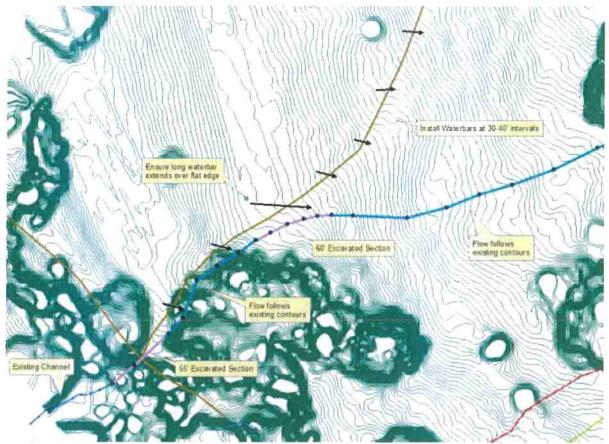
Topographic contours (at 1-foot elevation intervals) with flowpath divided into existing channel, sections for proposed excavation, and existing vegetated swale sections. Note: Topographic lines have not been edited to remove macro-vegetation so interpretation should be limited to open areas.
